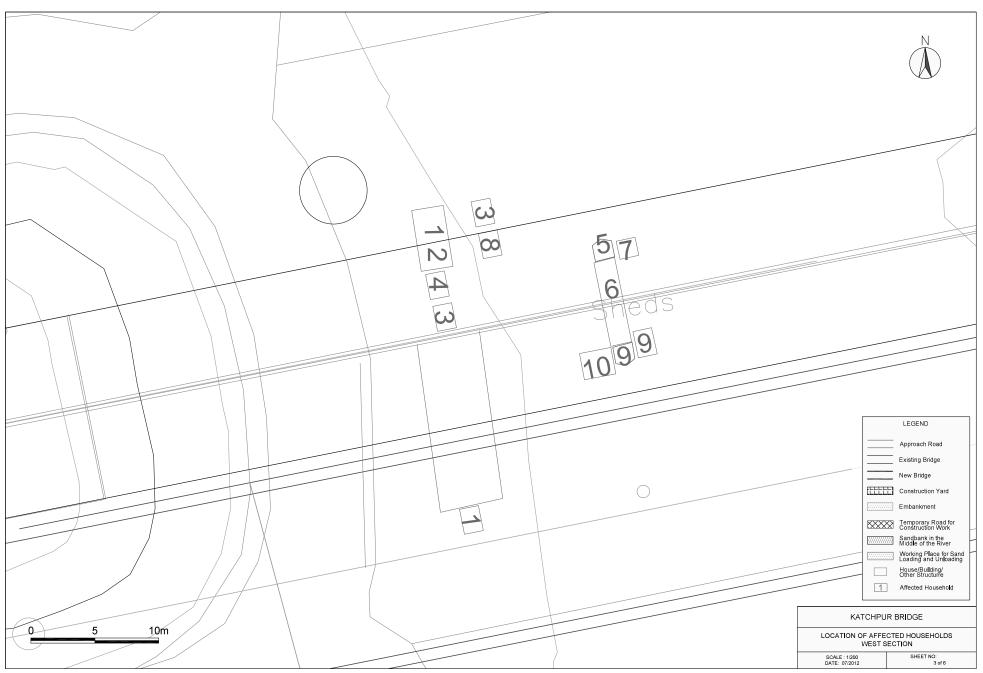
Location of Affected Households West Section (Sheet No.3)
